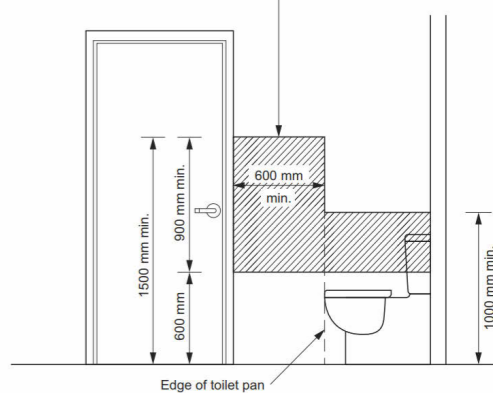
Location of noggings for a wall behind a toilet pan
